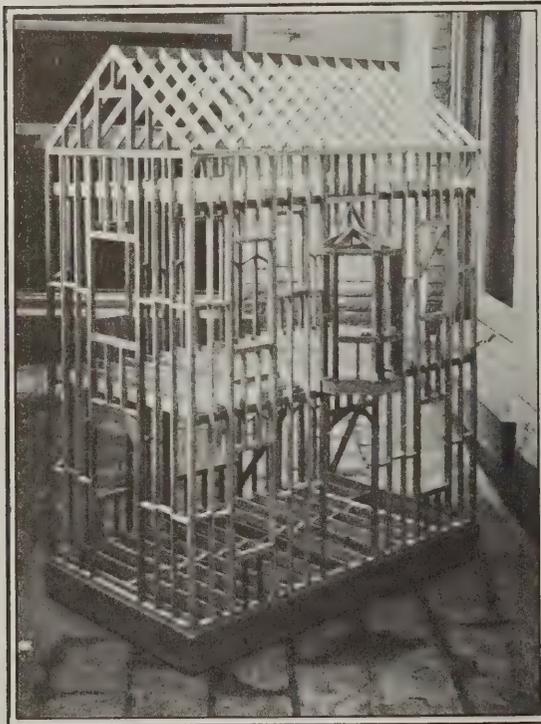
Perspective of Framing, Showing Front and Right Side Elevations
